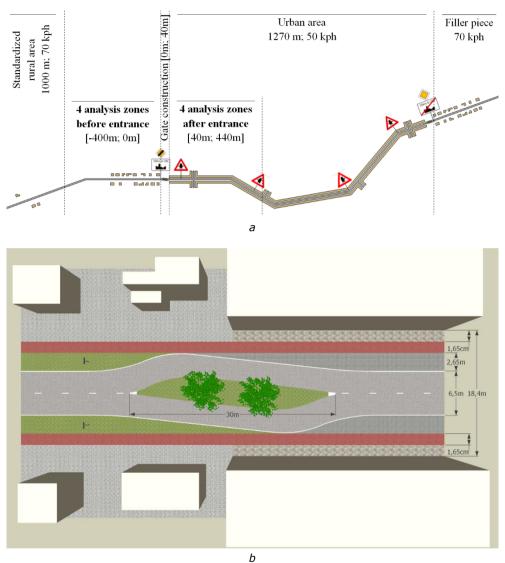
Plan view of (a) the transition zone and thoroughfare; and (b) the gate construction
